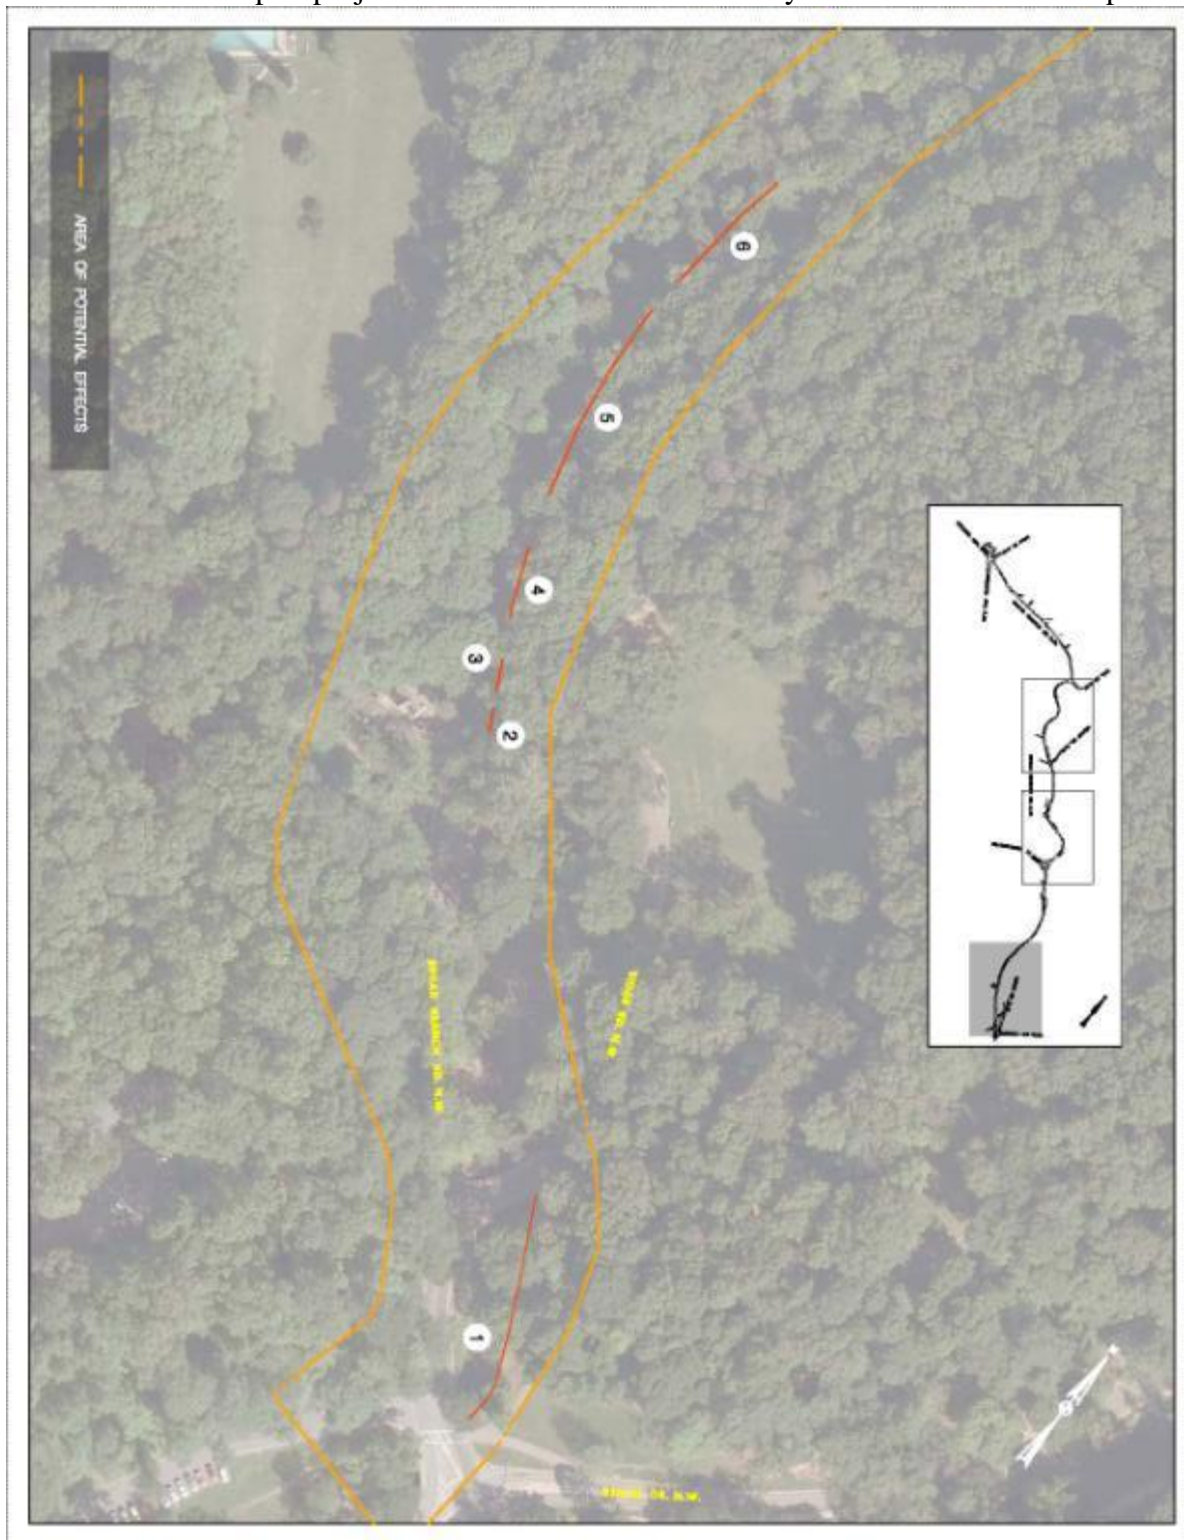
Location of Broad Branch Retaining Wall Segments, North of Beach Drive, NW, Rock Creek Park.
